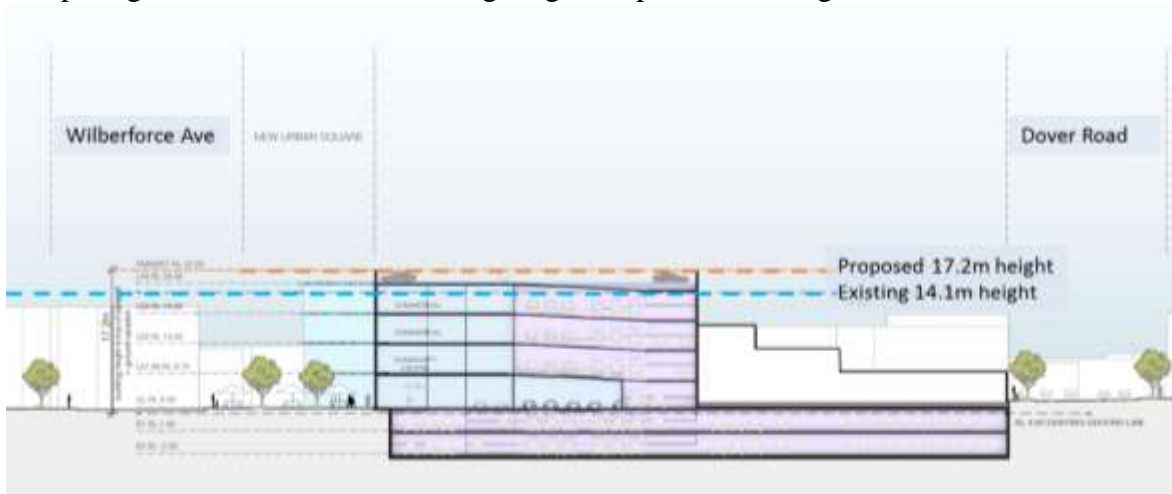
Section between Wilberforce Avenue and Dover Road showing the existing and proposed maximum building heights, concept for the site and surrounding existing buildings
